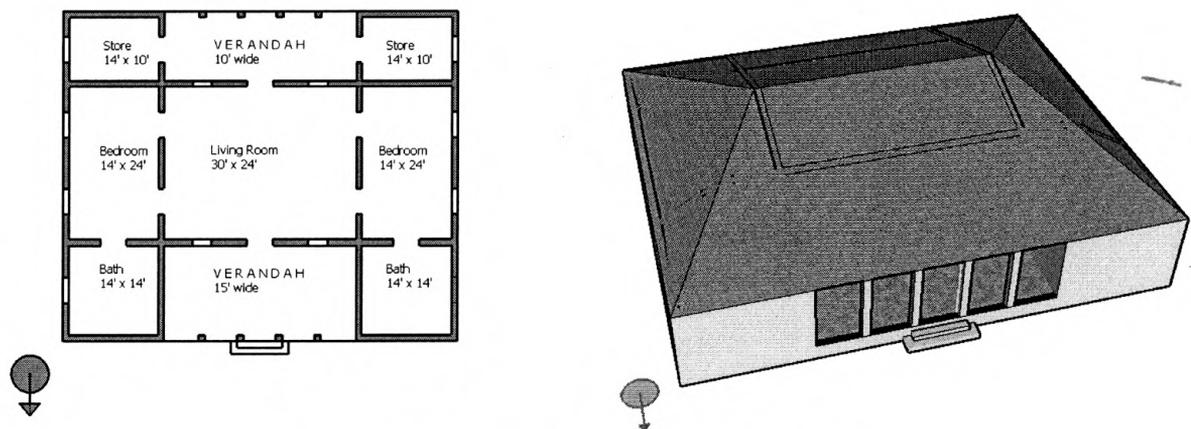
Typical Bungalow-Plan and Roof Structure
